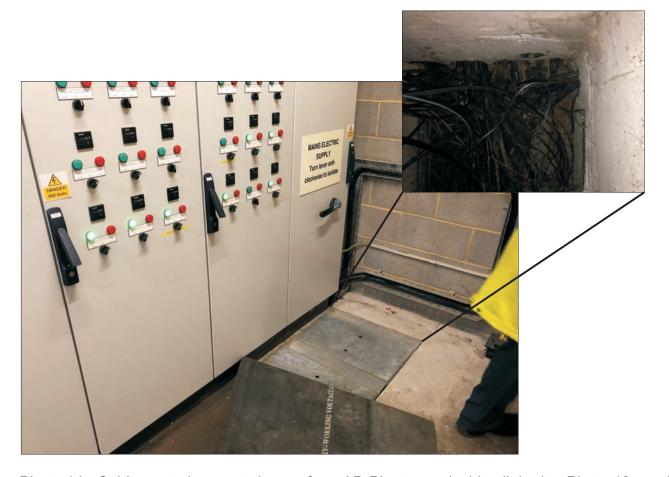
Cables entering control room from AD Plant area (cables linked to Photo 13 area)
